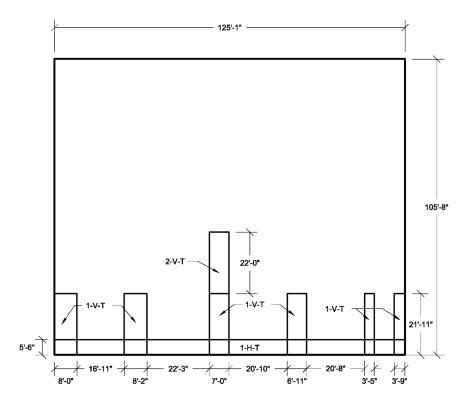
H.3-27 West Wall Looking East Transverse Reinforcement Zones
